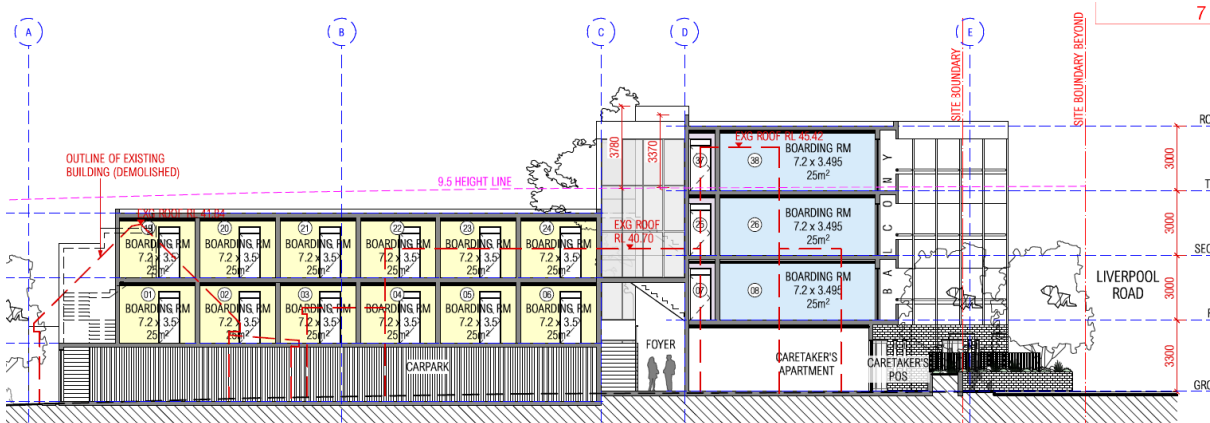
Extract of proposed section BB highlighting the building height non-compliance.
